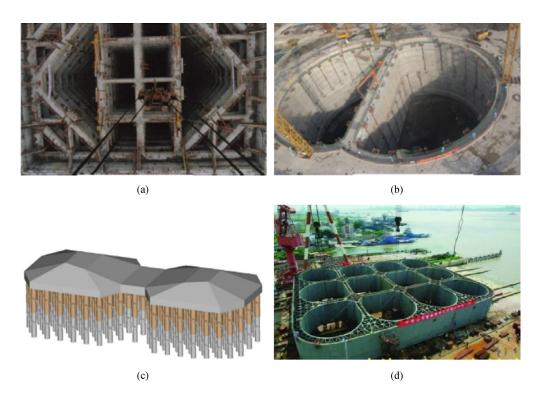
(a) Rectangular anchorage foundation of Runyang Yangtze River Bridge; (b) "\infty" shaped anchorage foundation of the Forth Nanjing Yangtze River Bridge; (c) pile group foundation of Sutong Yangtze River Bridge; (d) caisson foundation of Taizhou Yangtze River Bridge.
